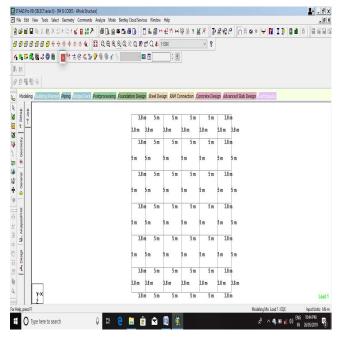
Geometry of Approved Plan in Staad Pro for All Standards.
